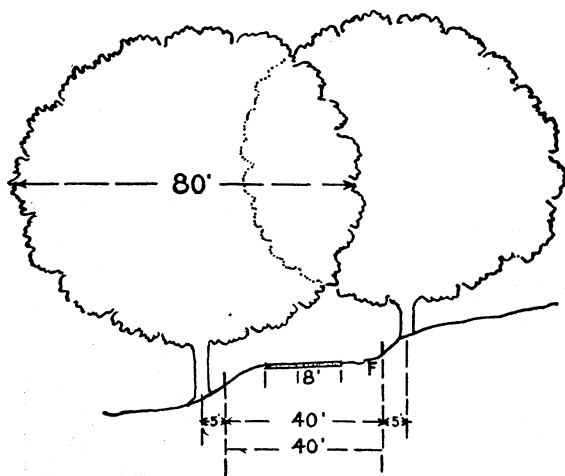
A 40-foot right of way with an 18-foot improved section and a narrow footpath (F). Because of the limited room the shade trees must be planted at the edge of or outside the right of way
